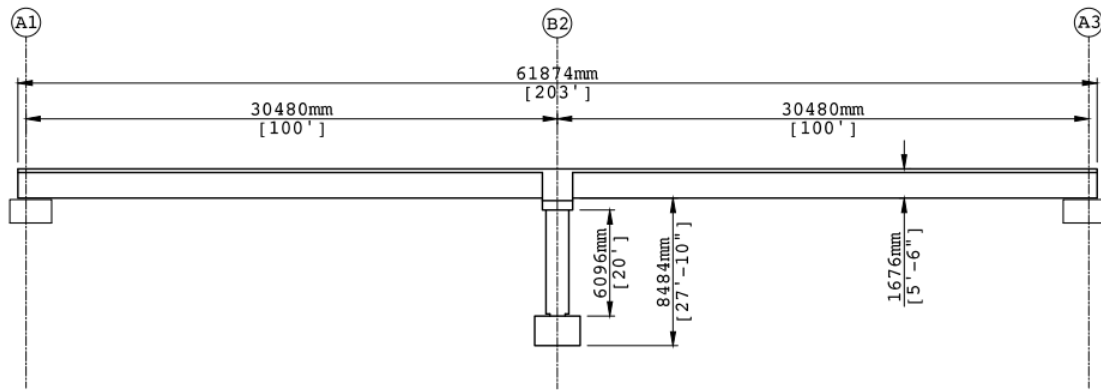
Elevation view of the suggested prototype bridge (Shoushtari et al., 2019)
